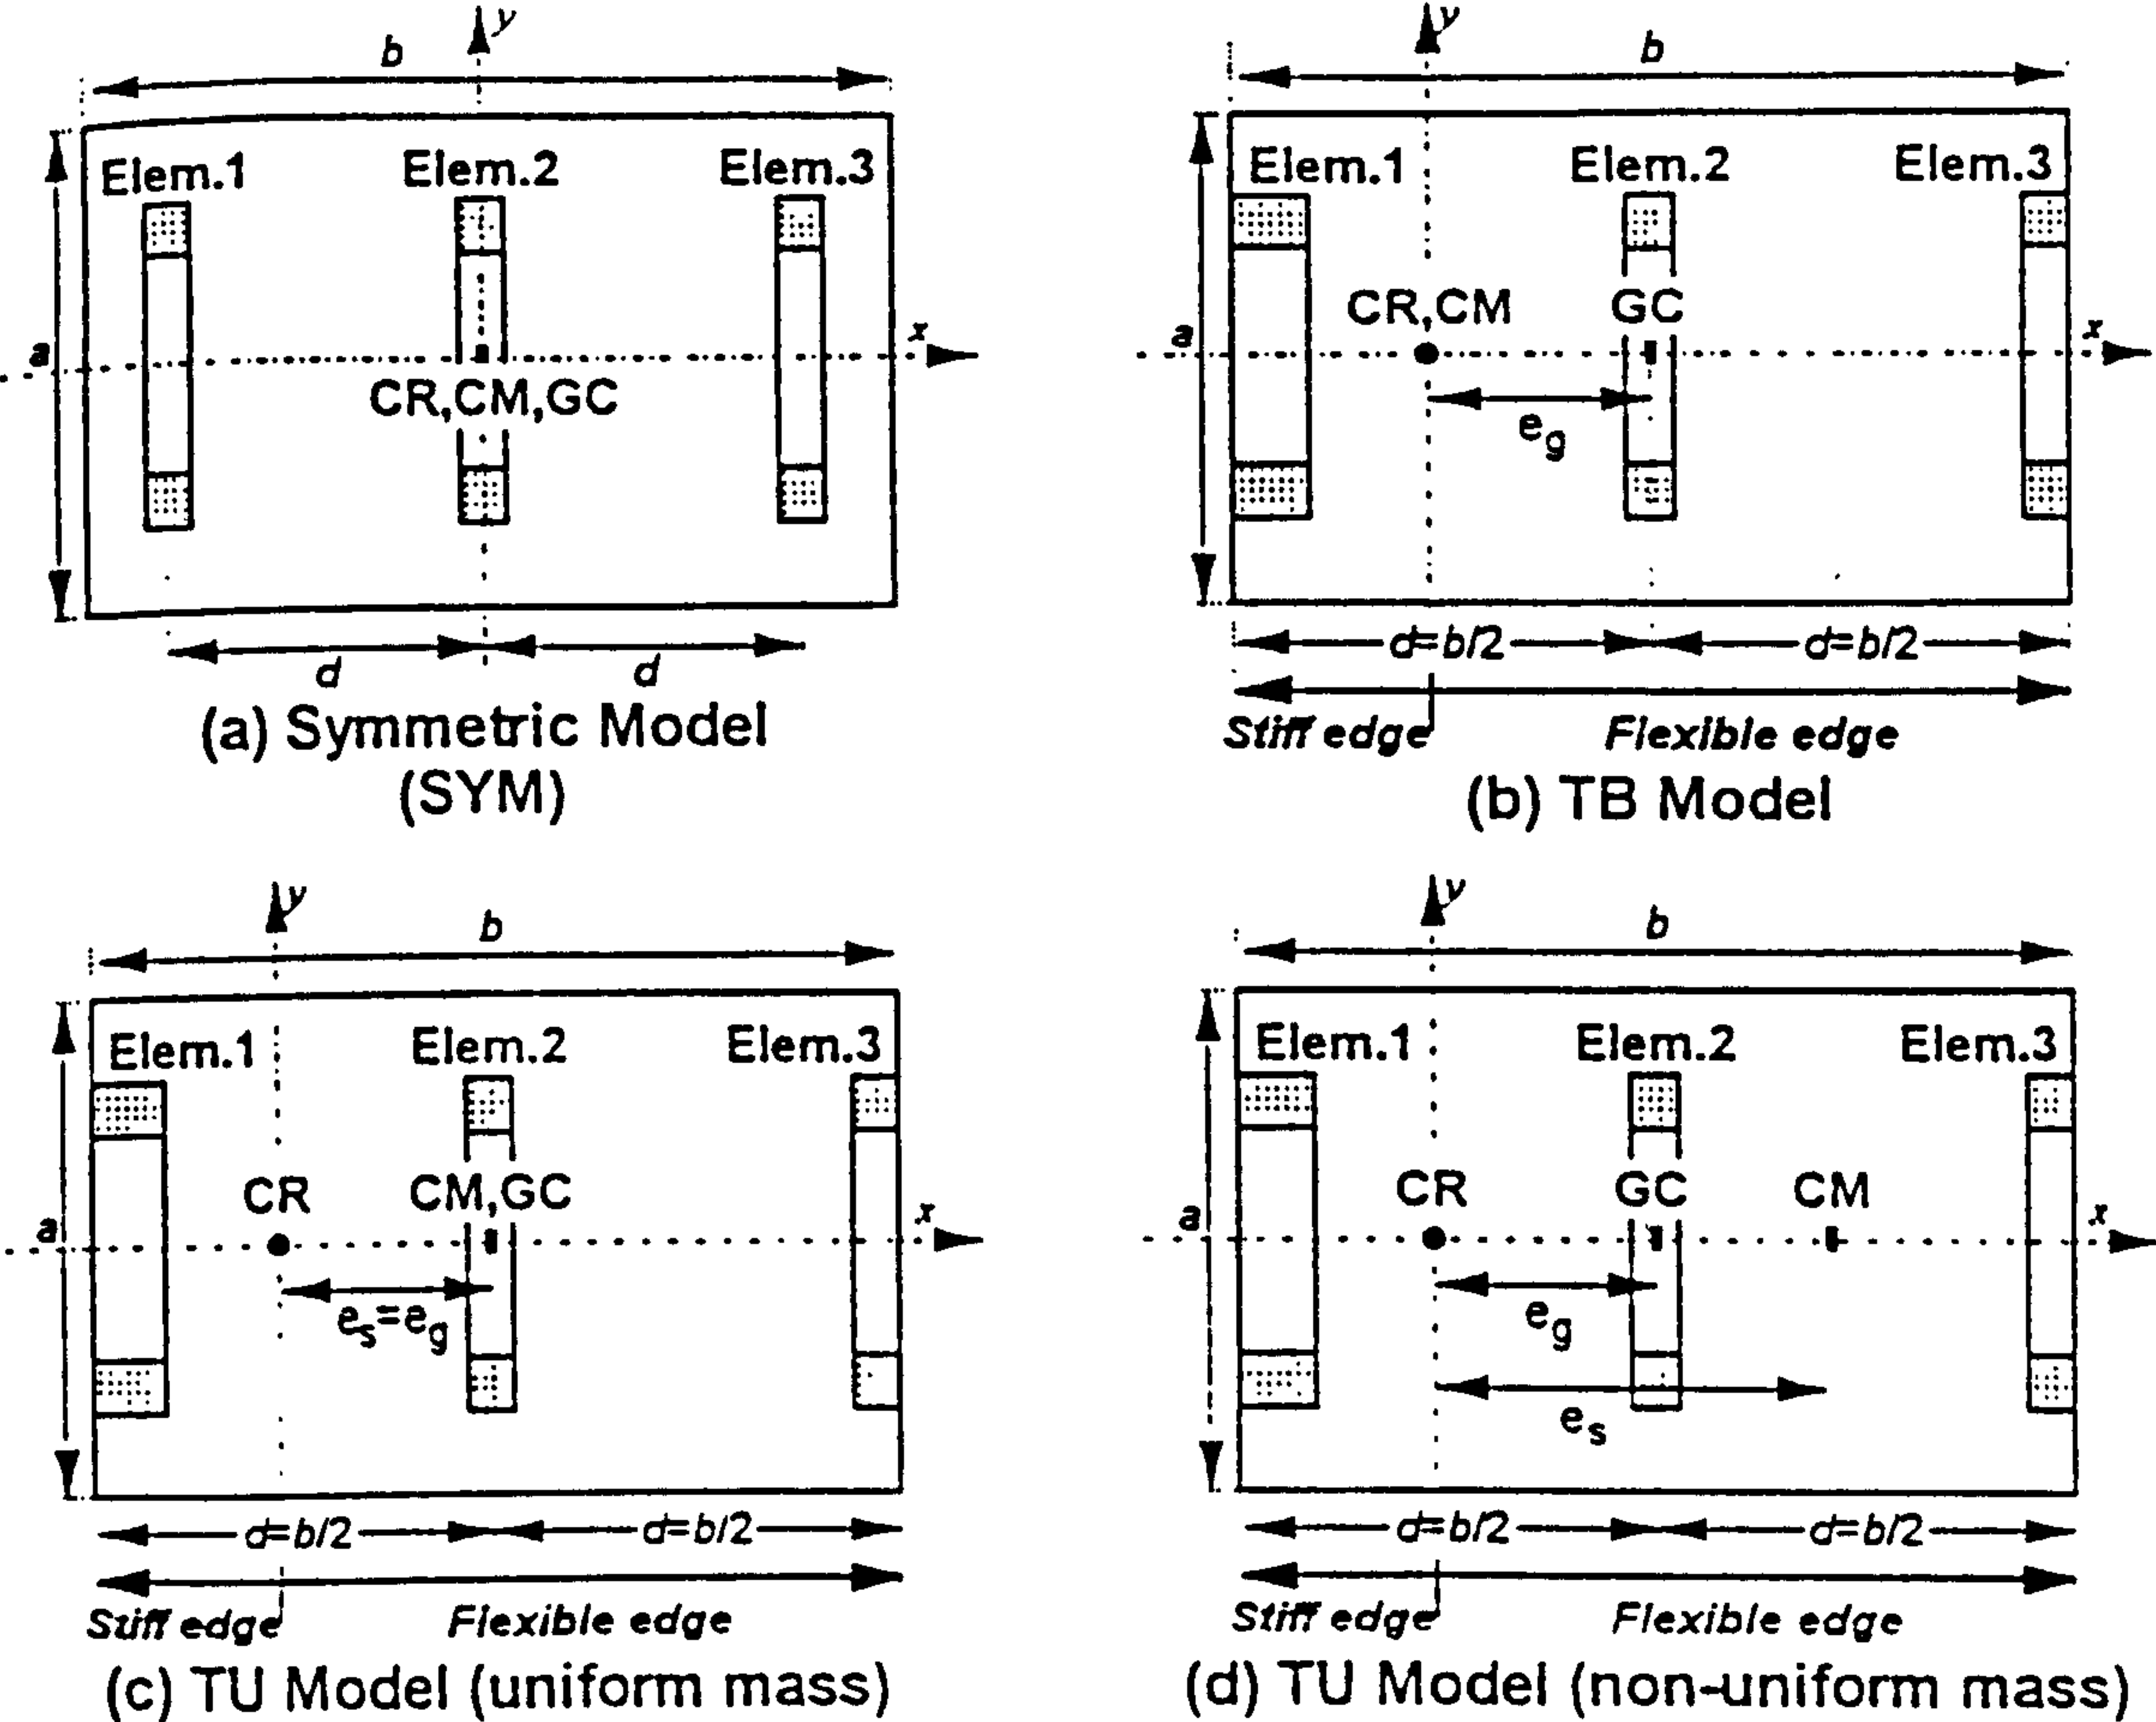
Structural plan configurations of typical 3-element models (Correnza, 1994).
